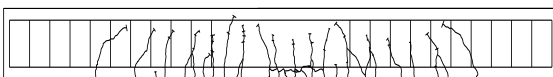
EP1 Strengthened Beam Crack Pattern
